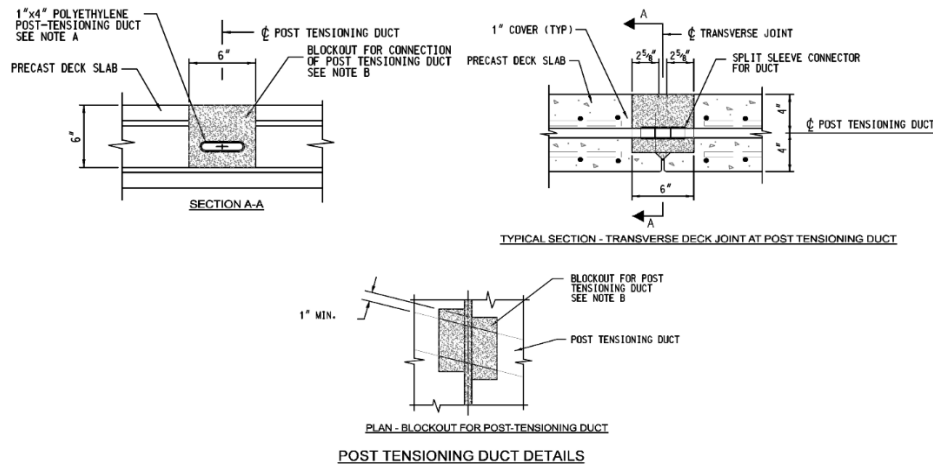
Deck-to-deck connection detail with post-tensioning first used in 1990
